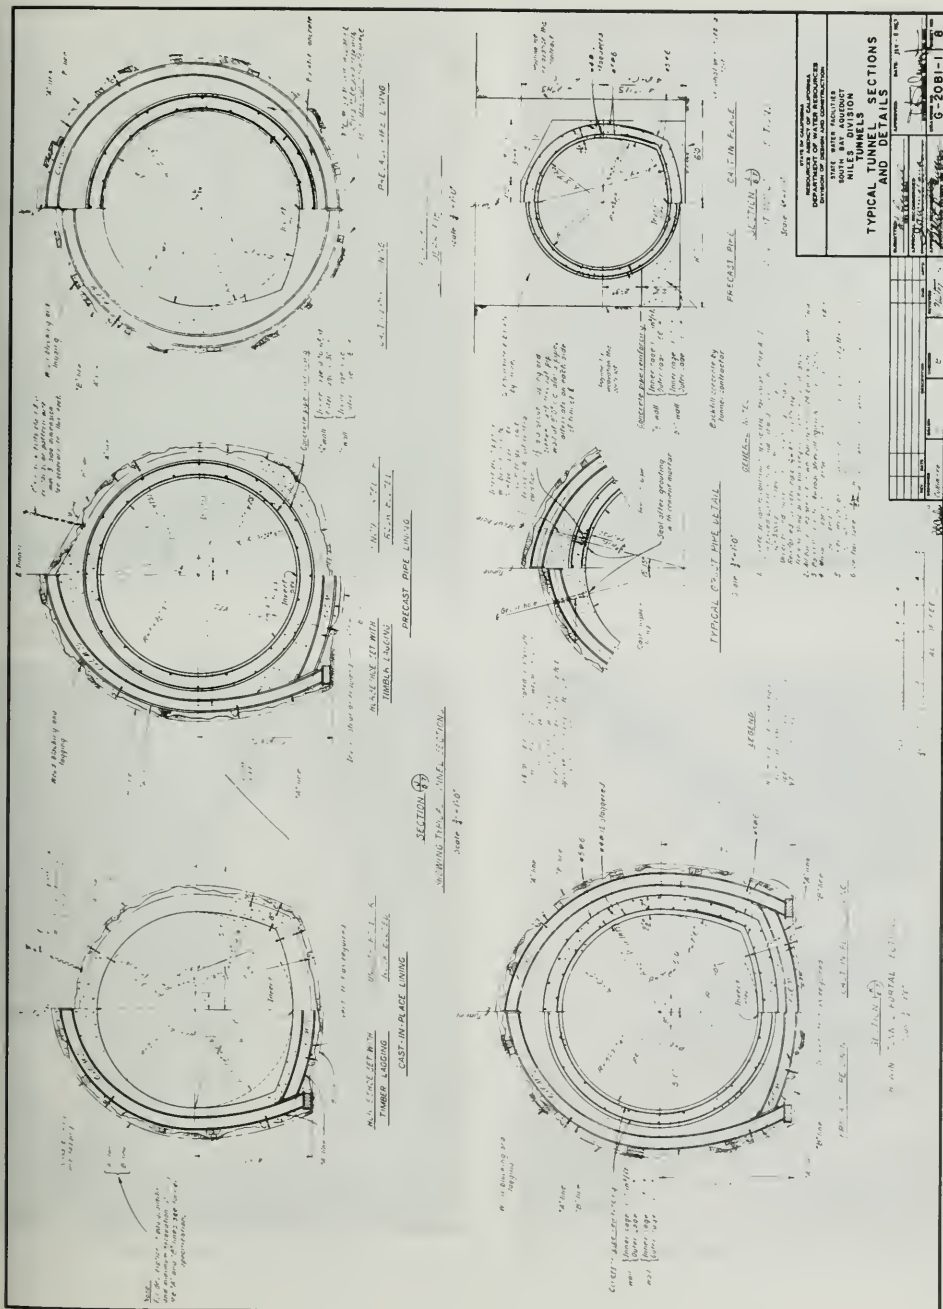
Typical Tunnel Cross Section—Mission and La Costa Tunnels
